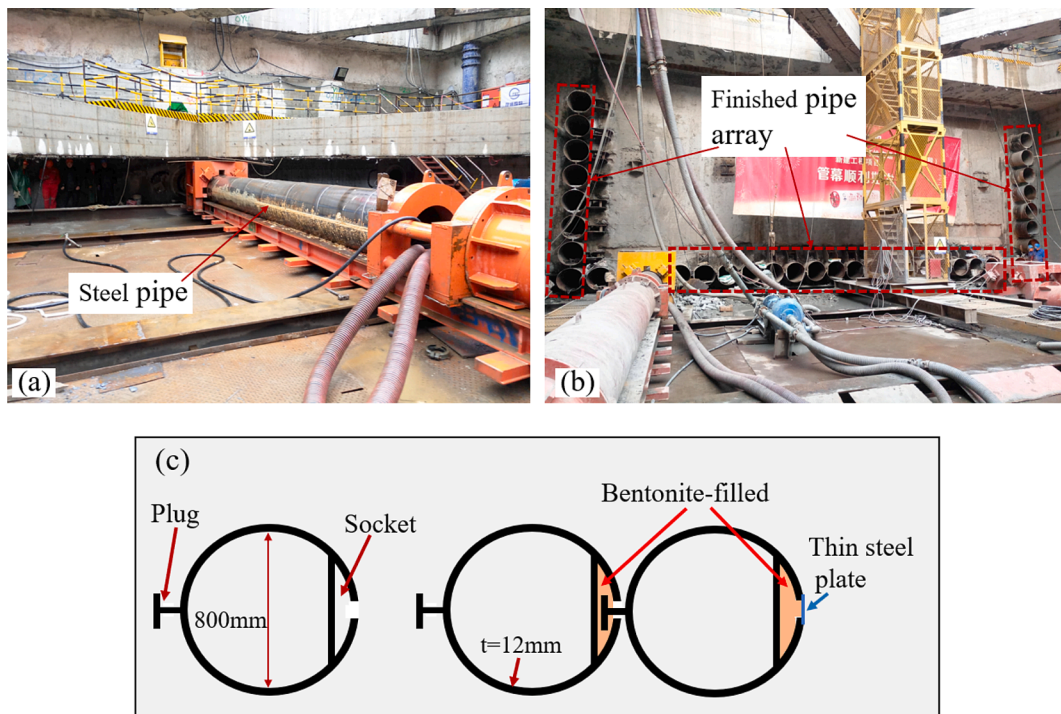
Pipe-roof preconstruction on the site: (a) pipe jacking (b) finished pipe array and (c) inter-pipe connection.
